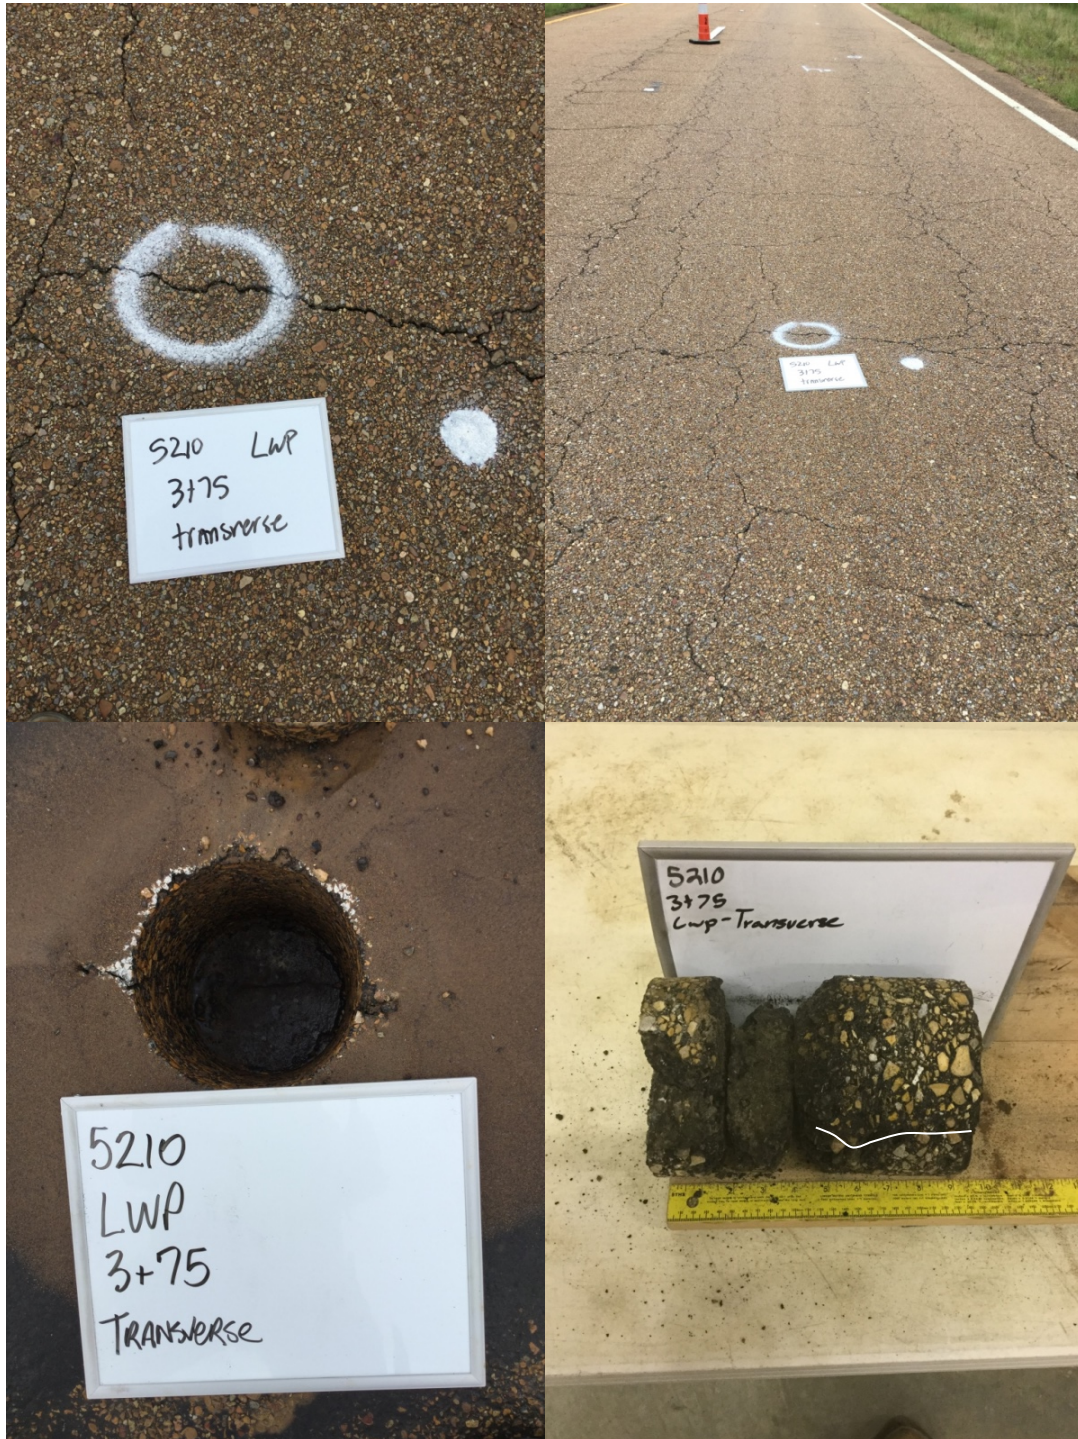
Pavement Surface and Core from Transverse Crack - Section 5210, Station 3+75
